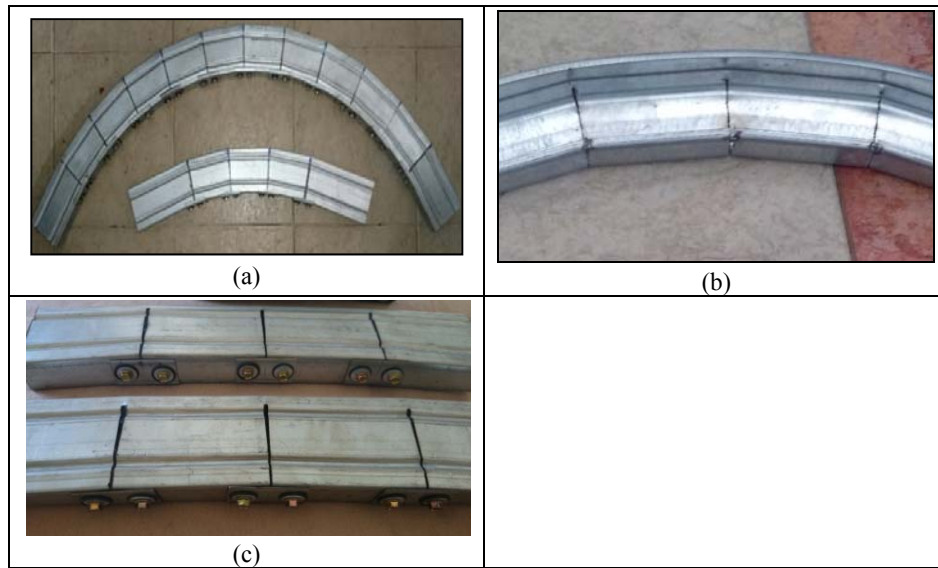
(a) Example of cold-formed steel channel curved section (CFSC-CS), (b) CFSC curved section with spot weld and (c) CFSC curved section with plate and self-drilling screw.
